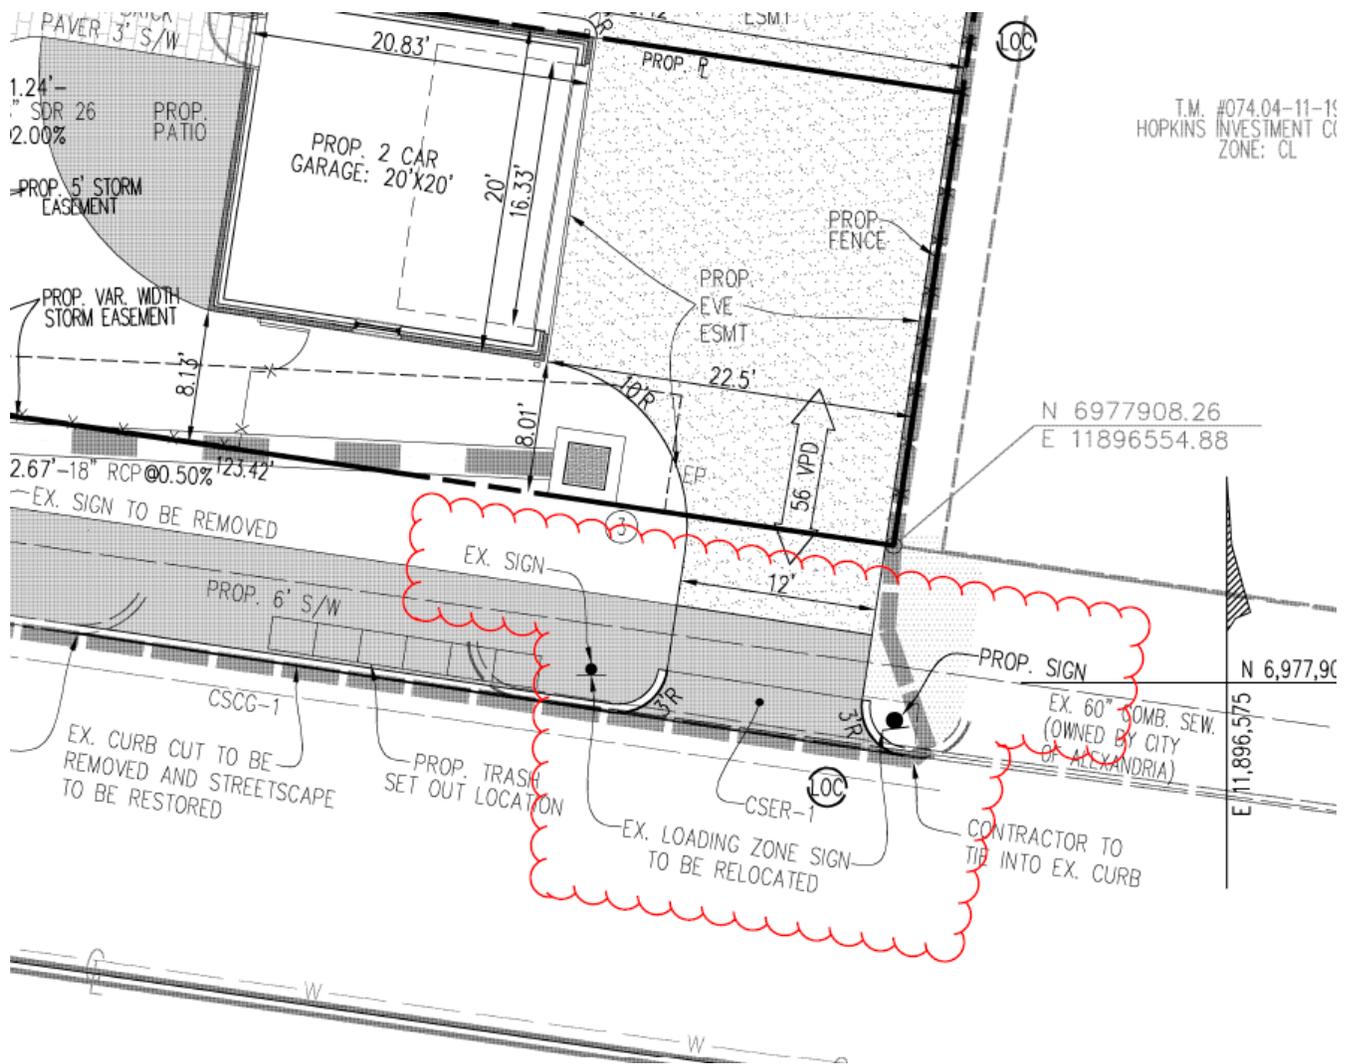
shows the existing and proposed location of the Loading Zone sign and the proposed driveway entrance into the townhome complex
